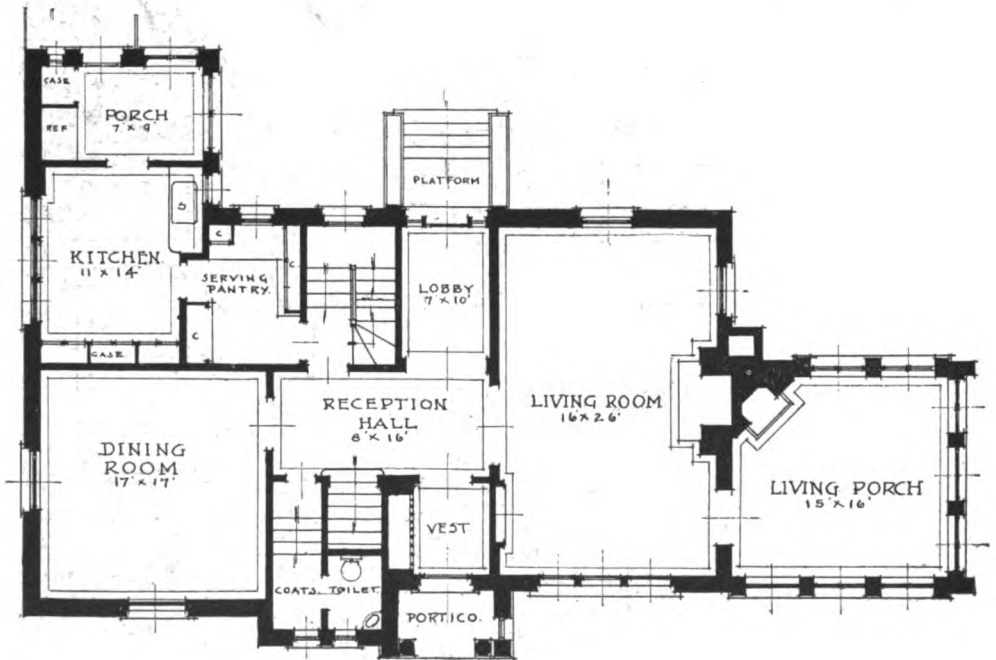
VIEW AND FIRST FLOOR PLAN—
